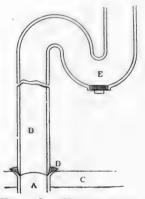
Sketc: showing the cup-joint method of connecting lead pipe. A, Waste pipe; B, sink connection; C, floor; D, solder joint. or cup; E, trap.
